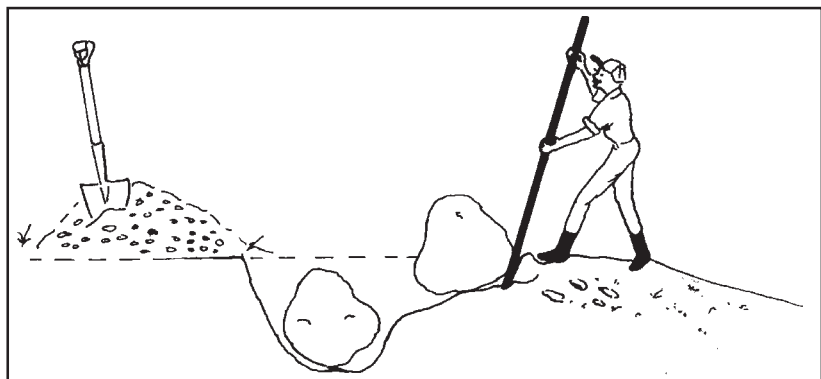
E2.4 BOULDER REMOVAL BY LABOUR USING CROWBARS
